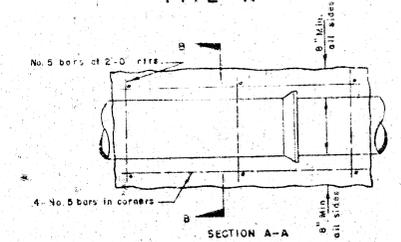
DETAIL OF DROP STACK FOR EXISTING MANHOLES IN GROUND WATER
